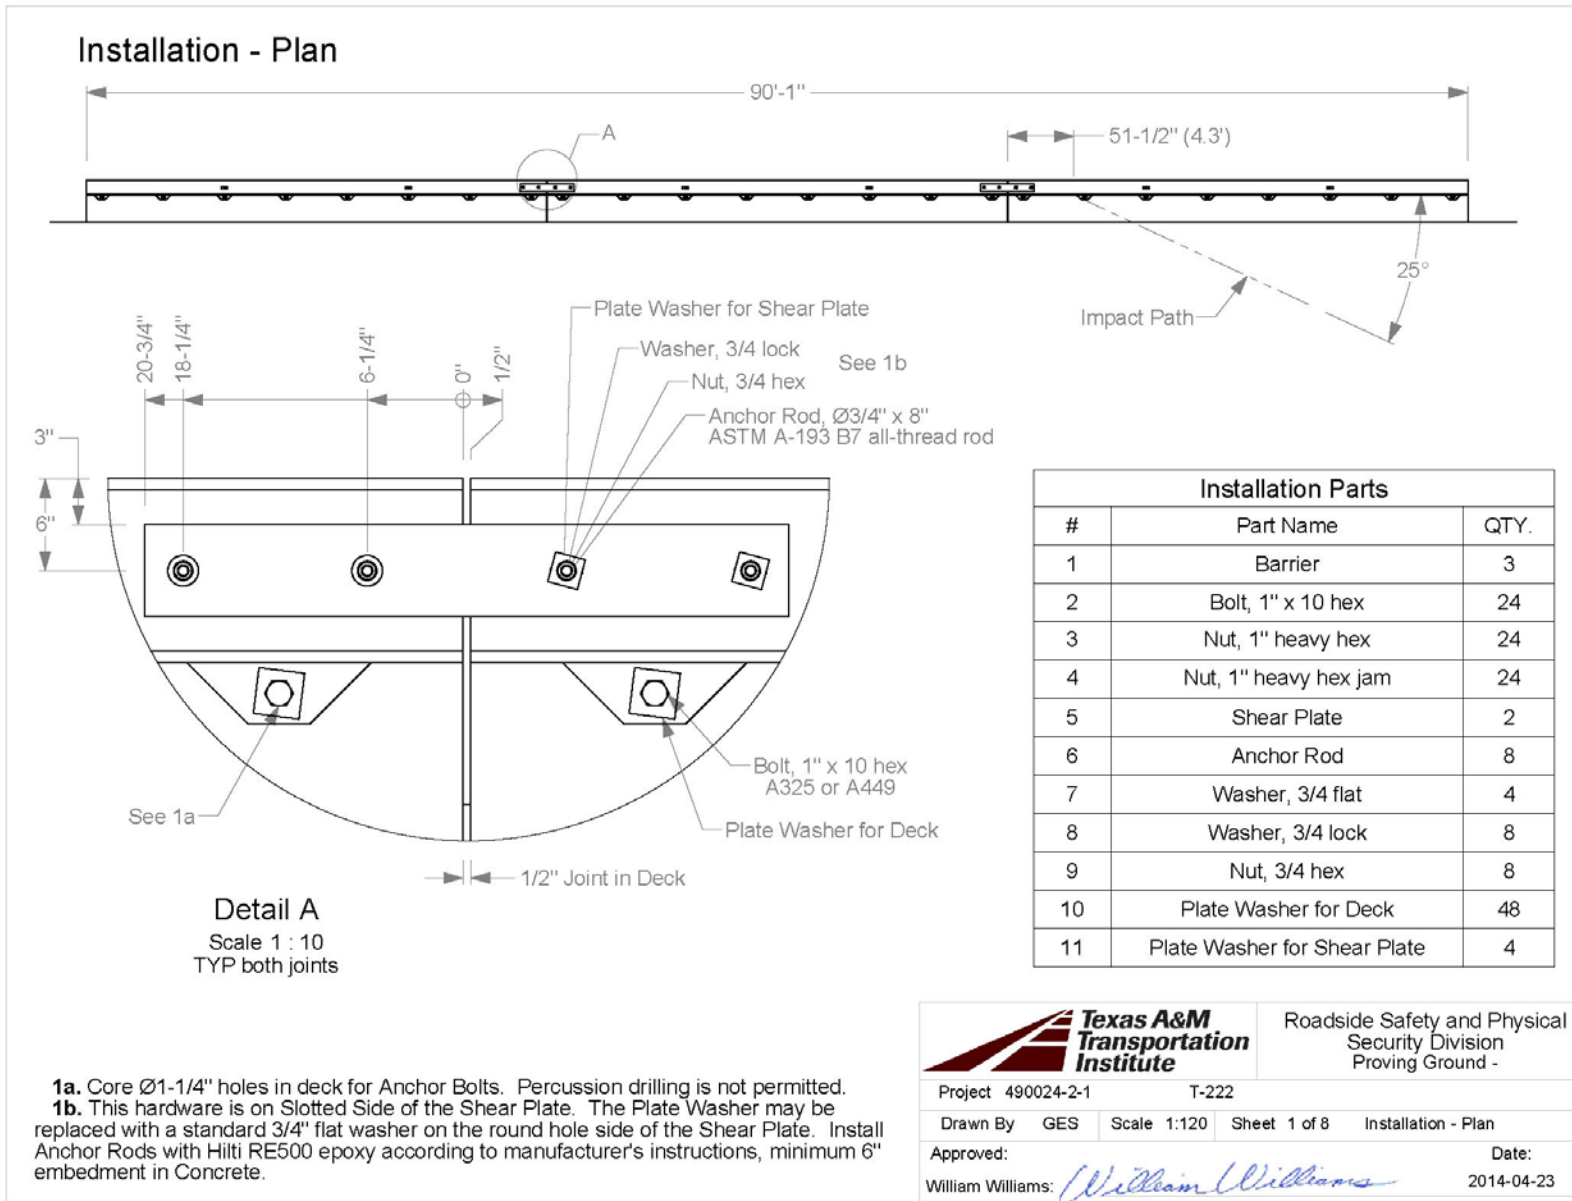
provides an overall layout of the TxDOT T222 Precast Traffic Rail, and Attachment A provides detailed drawings. Figure 2.2 shows photographs of the installation before testing.
